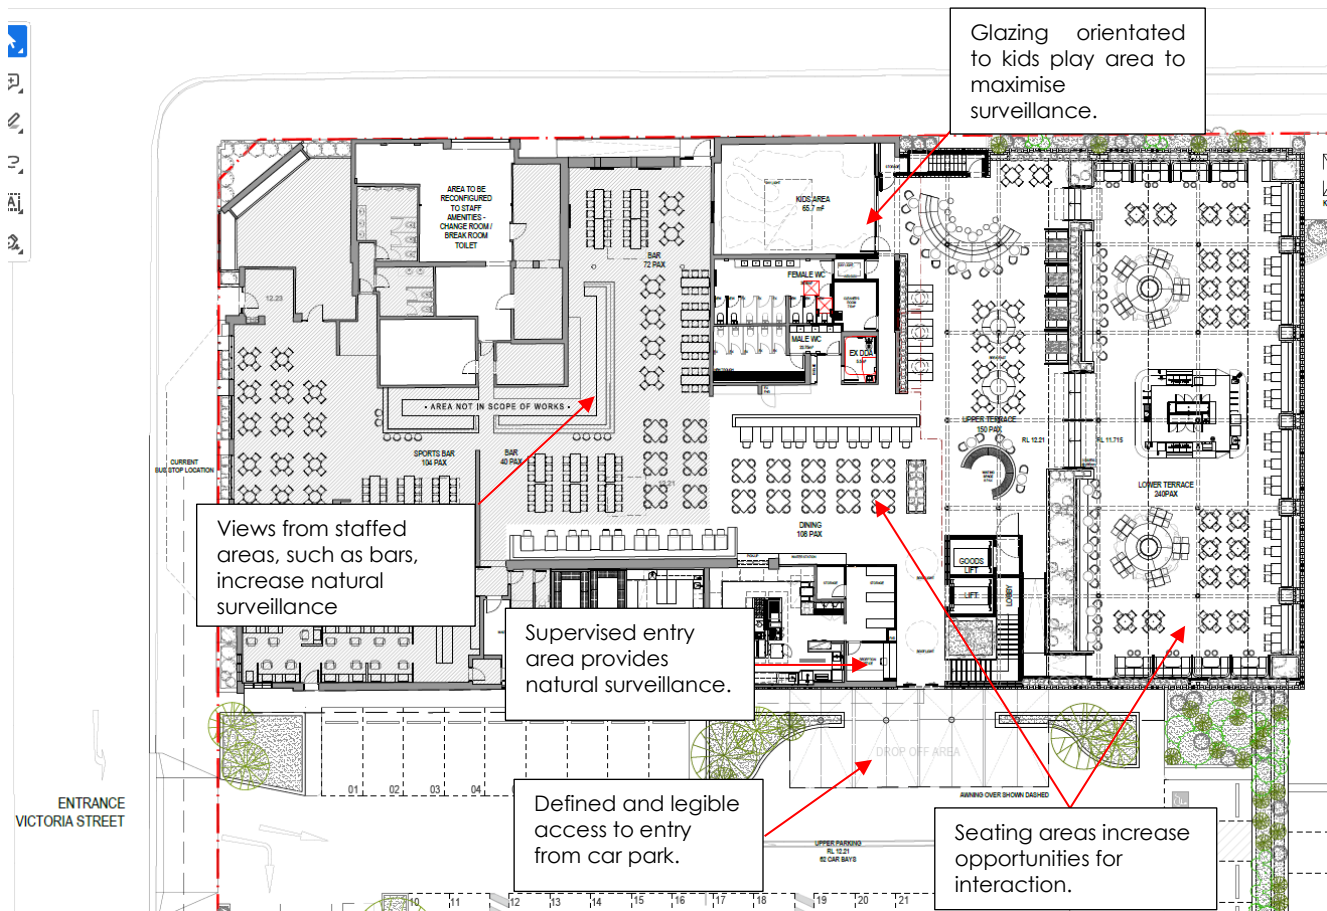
Extract from Ground Floor Plan (Source: loopcreative, 2023)
